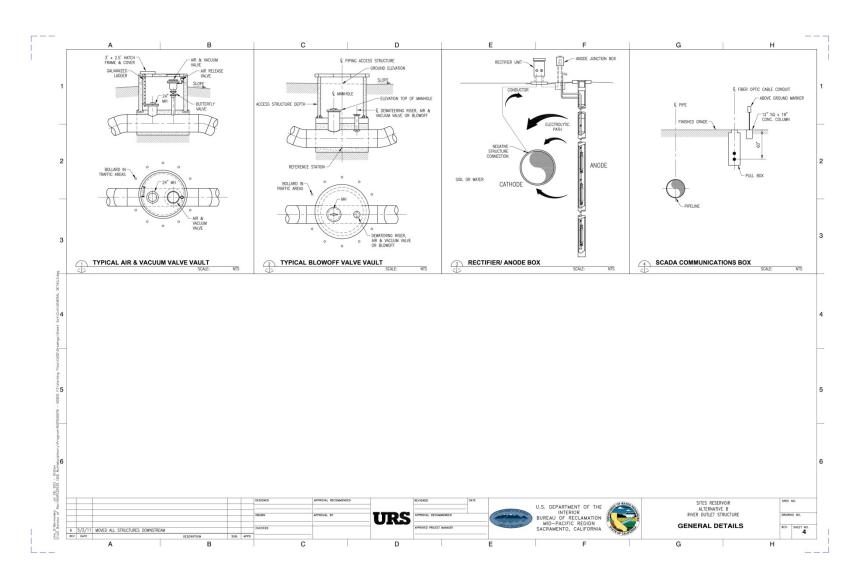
Typical Pipeline Air Valve and Blow-off Details
